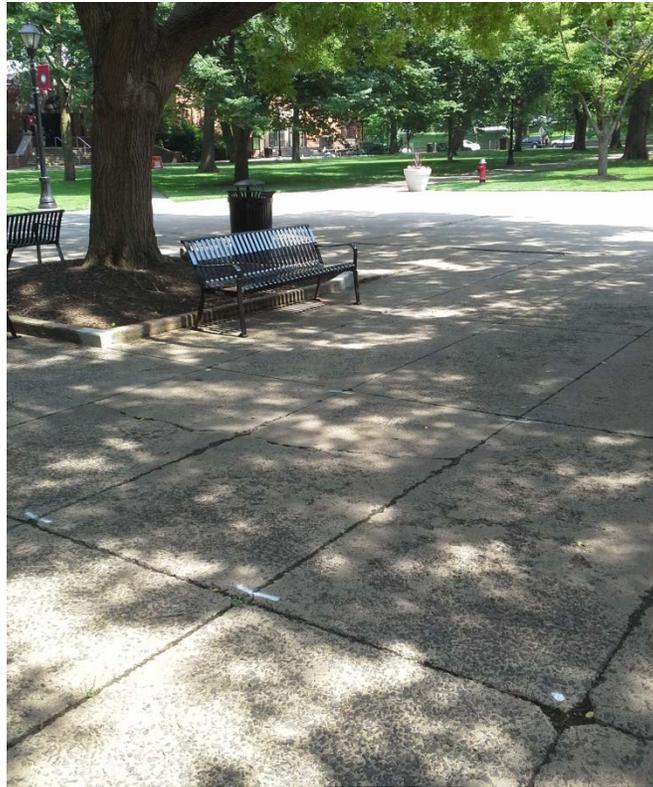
Photo of 656 Bartholomew Road excavation site.
